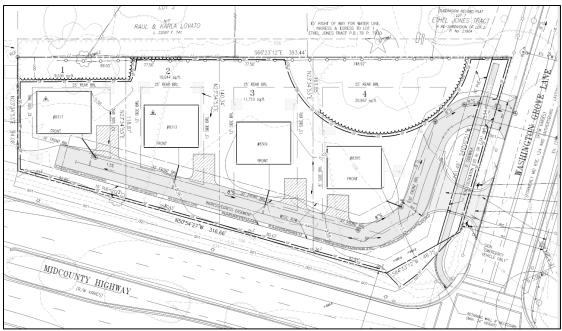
Preliminary Plan (Buildings Footprints Are Conceptual)
